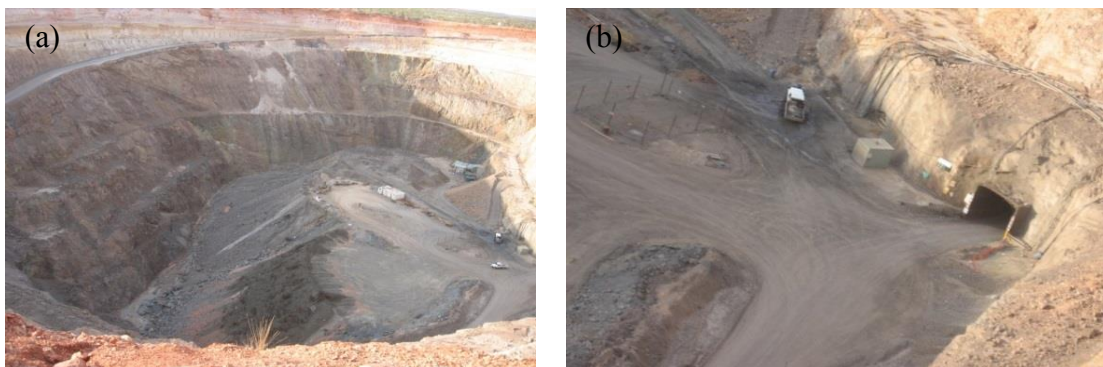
(a) Open pit (surface) mine and (b) underground mine in Queensland, Australia
